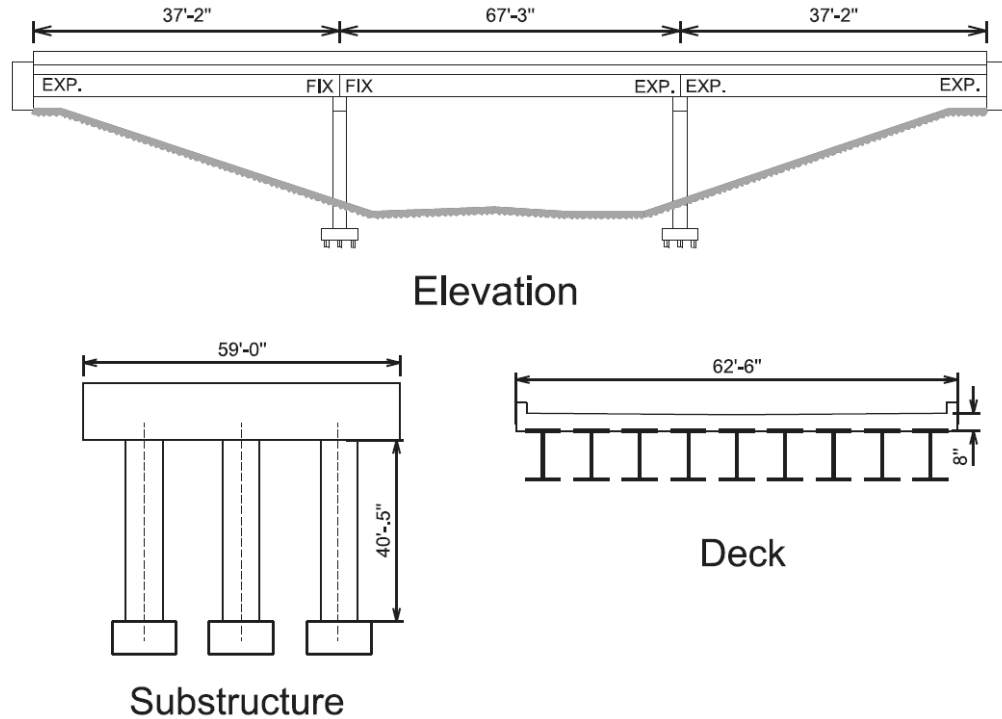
Multi-Span Simply Supported Steel Girder Bridge Layout.
